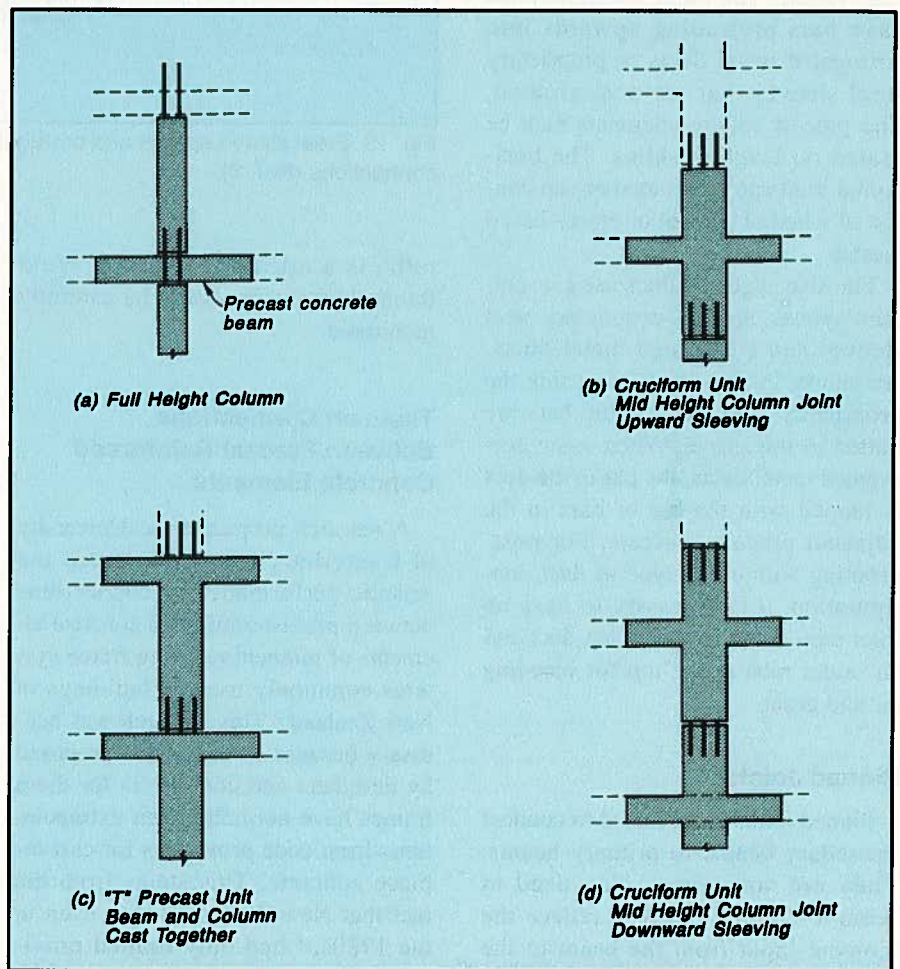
Typical connections between precast concrete column elements (Ref. 3).
